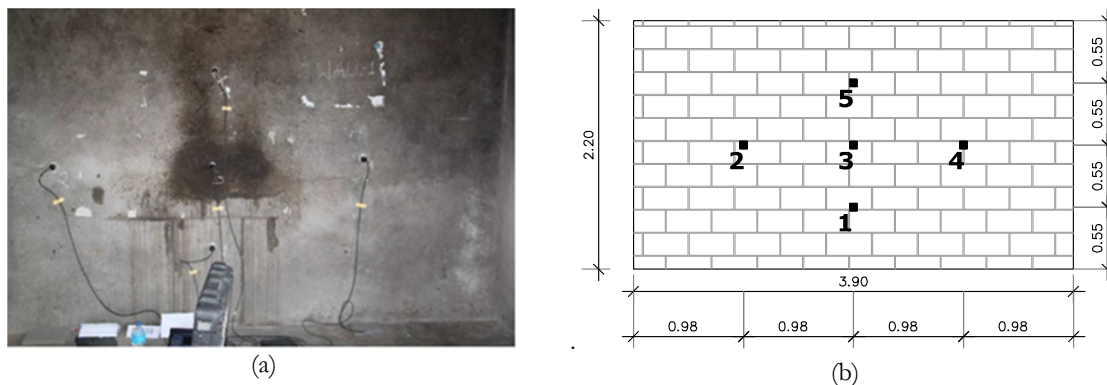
Ambient vibration test on external wall; (a) Geometric dimensions, and (b) Test setup [32]
